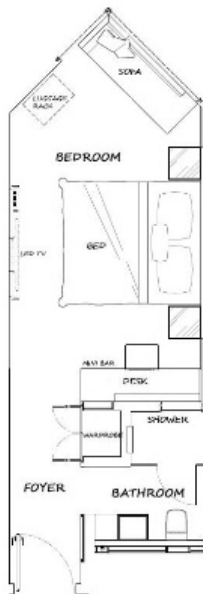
The architectural space planning and façade design to capture a preferred view [6]
